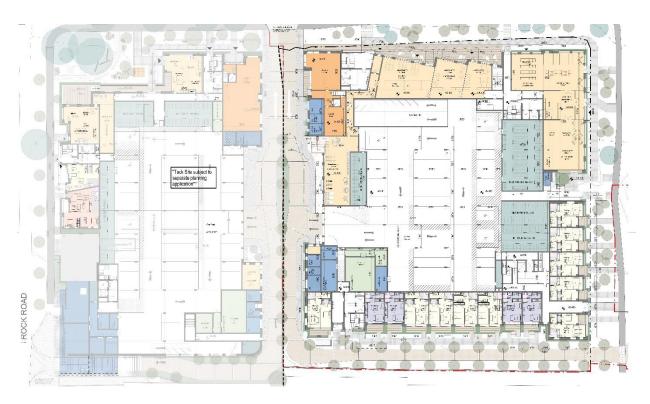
Parking Layout at Lower Ground Level (45 spaces)
